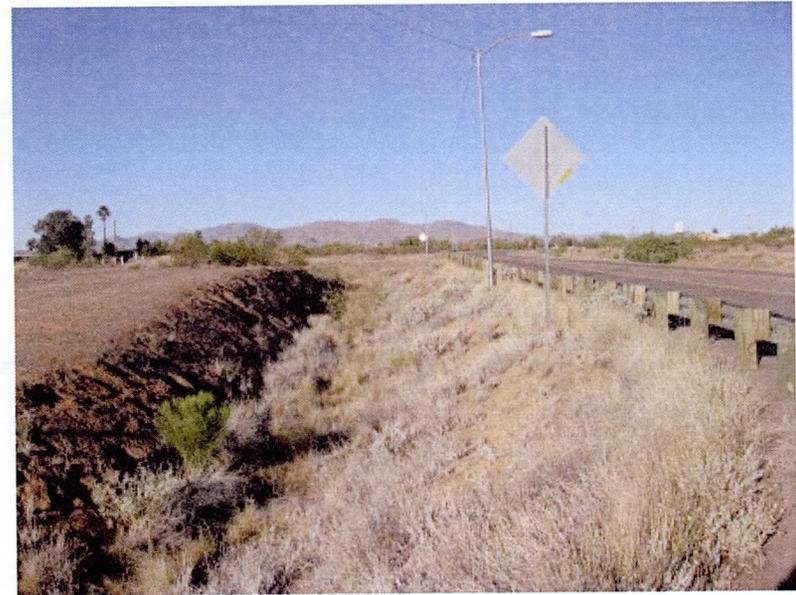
Looking SW down drainage ditch on the southeastern side of Happy Valley Road.
